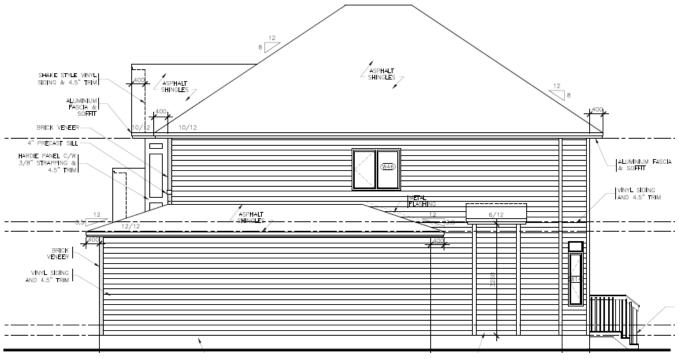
Typical interior side elevation drawing of a proposed dwelling unit model
